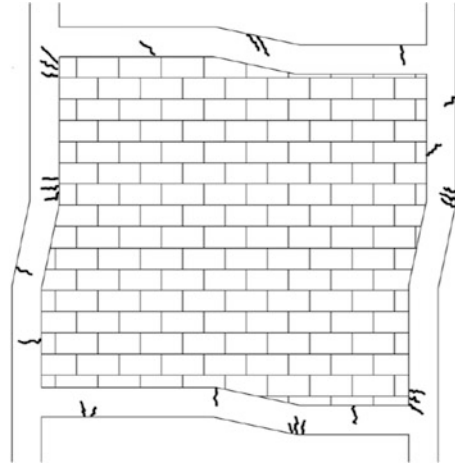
Failure modes for surrounding reinforced concrete frame
